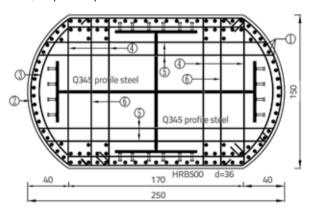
Bridge pier reinforcement (Q345 profile steel)
